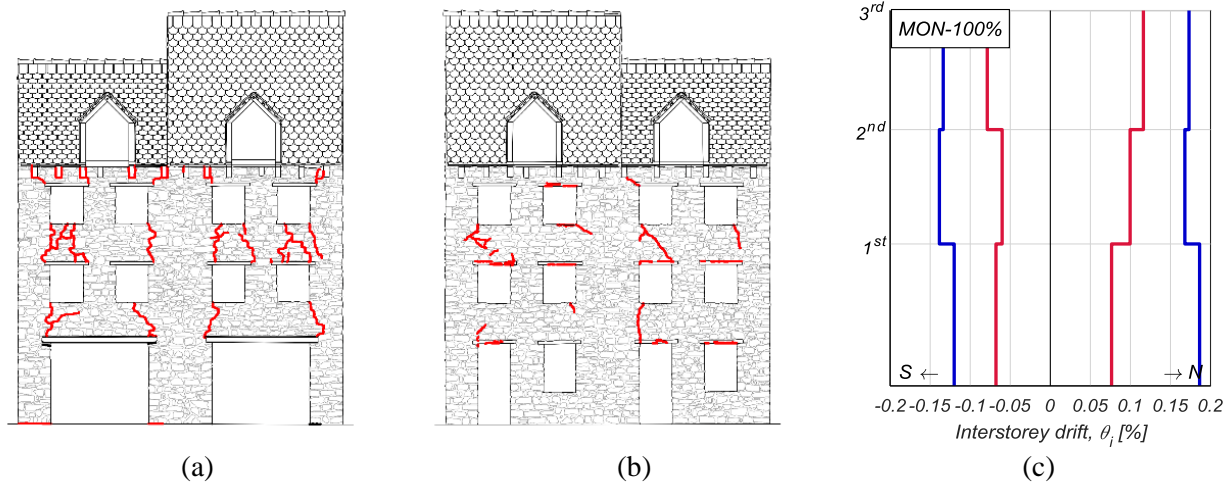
Results after test with PGA of 0.204 g: (a) West wall crack pattern; (b) East wall crack pattern; (c) interstorey drift envelopes, West wall in blue and East wall in red.
